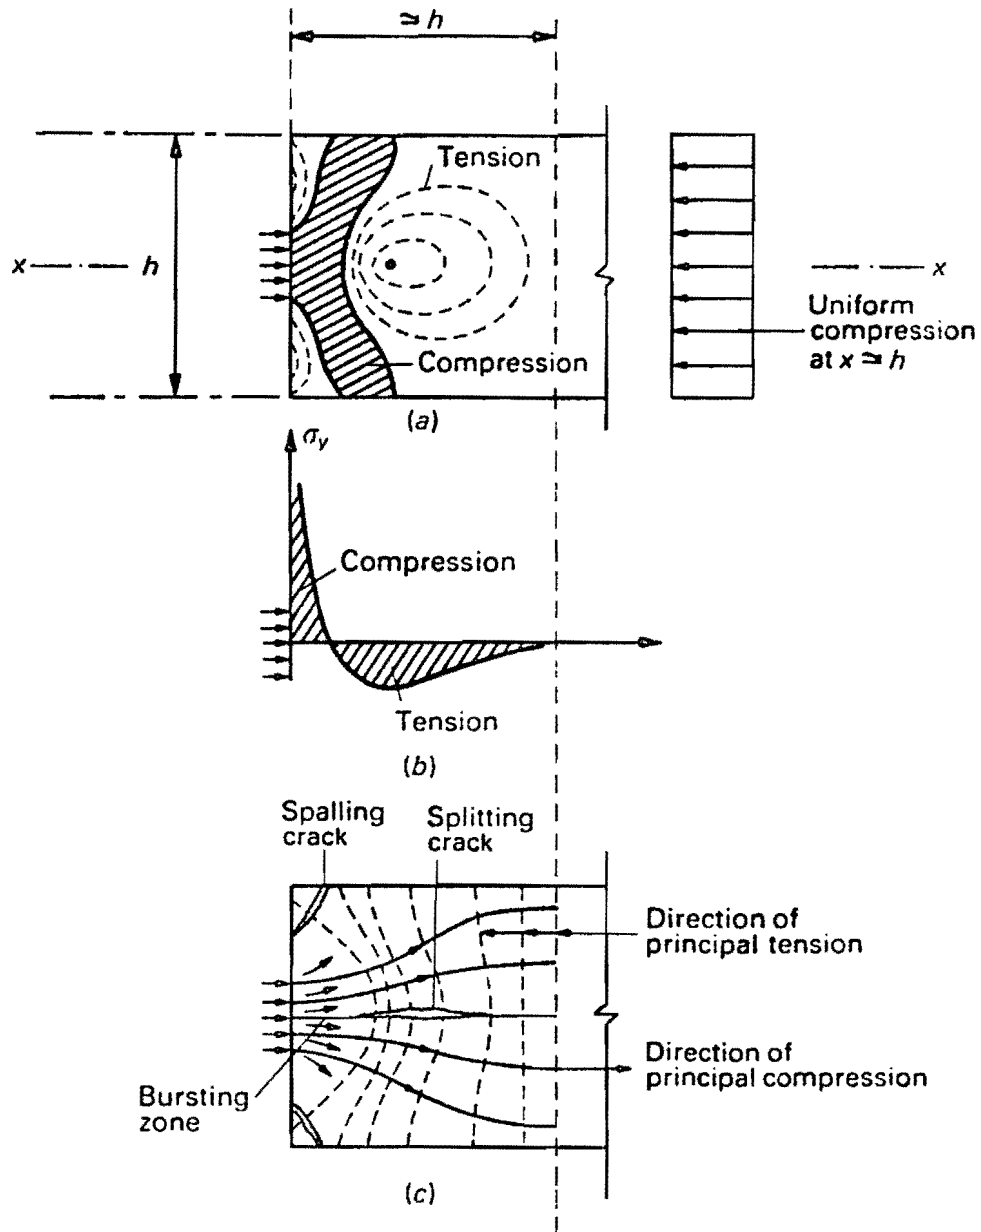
Compressive and tensile stresses at the ends of each pavement section (Ref 87).
